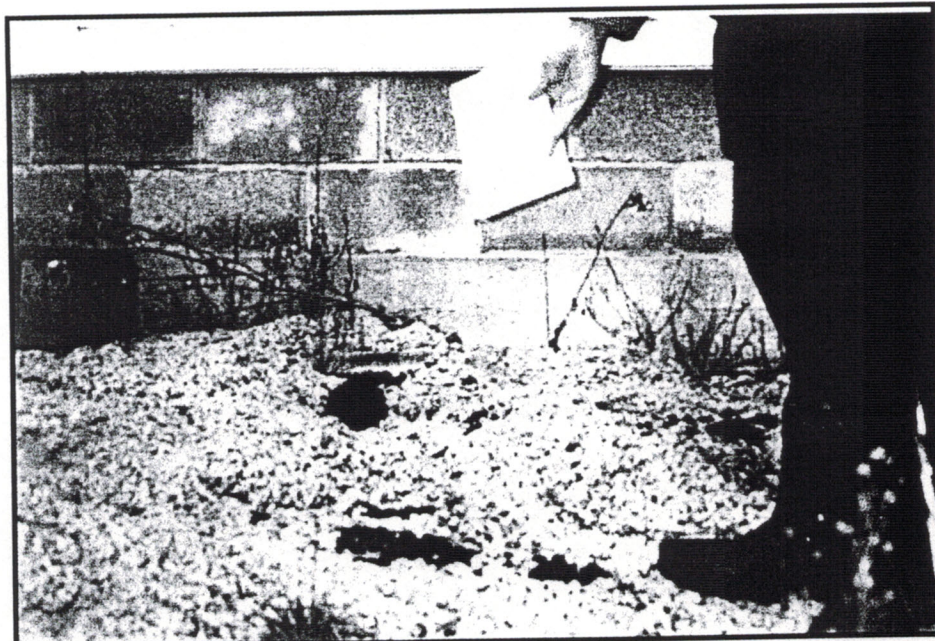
Two plastic drainage pipes originating from a house at site 1.
